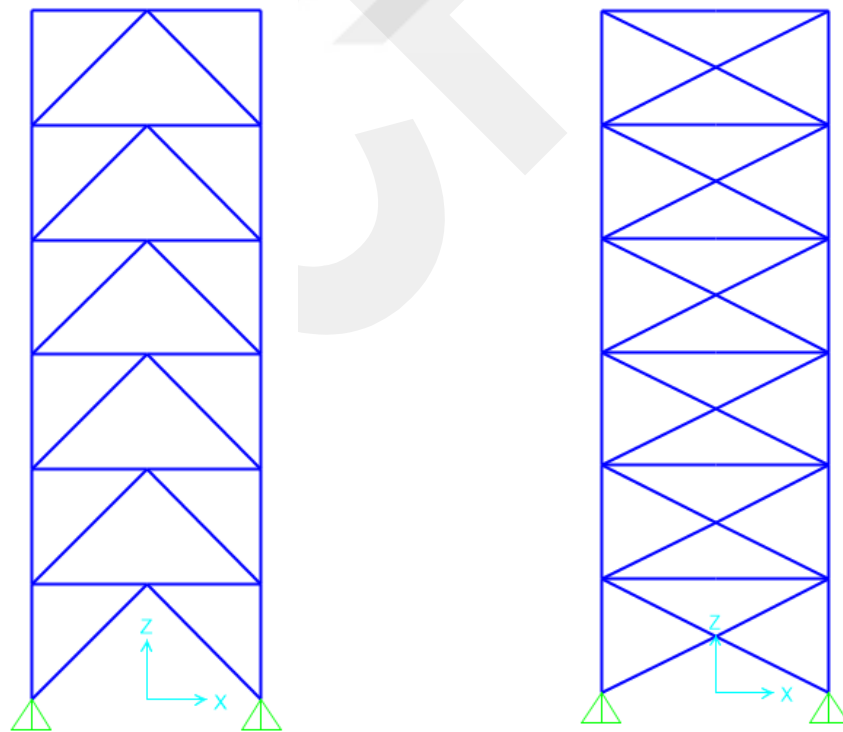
Inverted V- and X-Type Steel Bracing Systems
